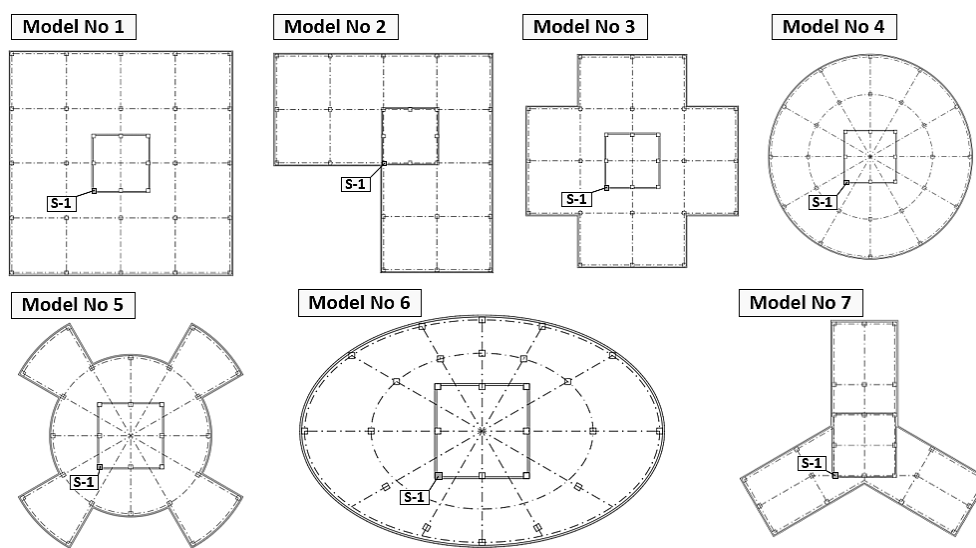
Cross-sections of a high-rise building with the use of various cross-section models. The reinforced concrete internal core of the building with columns is marked. The S-1 column is distinguished, the detailed analysis of which is presented in the article (*own research*)
